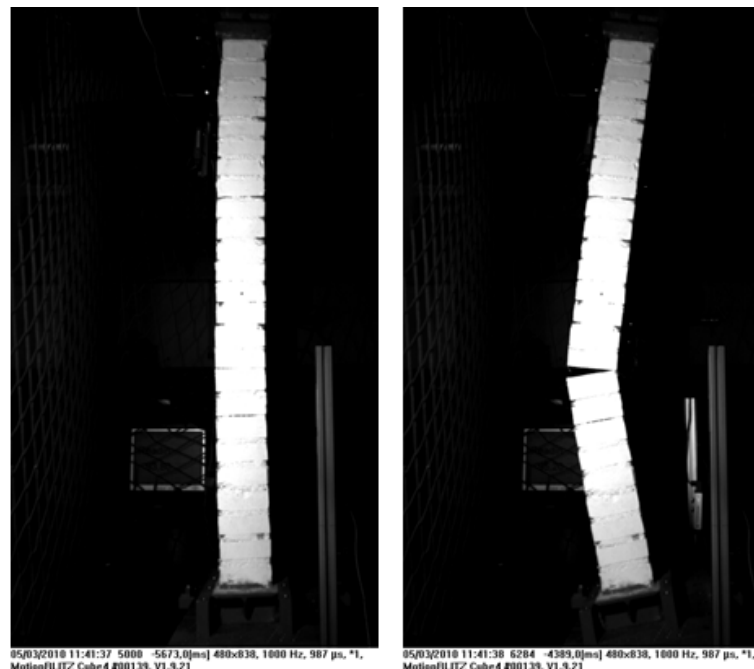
161 Failure of the wall W#13. Opening of a horizontal mortar joint at approximately $\frac{1}{3}$ height
